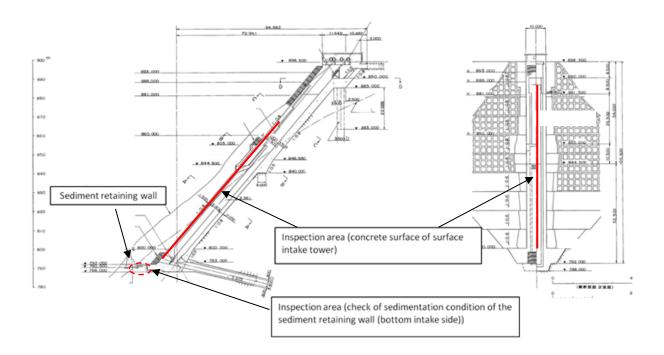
Inspection Point at the Naramata Dam (3): (h) Inspection area for the concrete surface of the intake tower of the surface intake facility, and (i) the sedimentation at the sediment retaining wall
